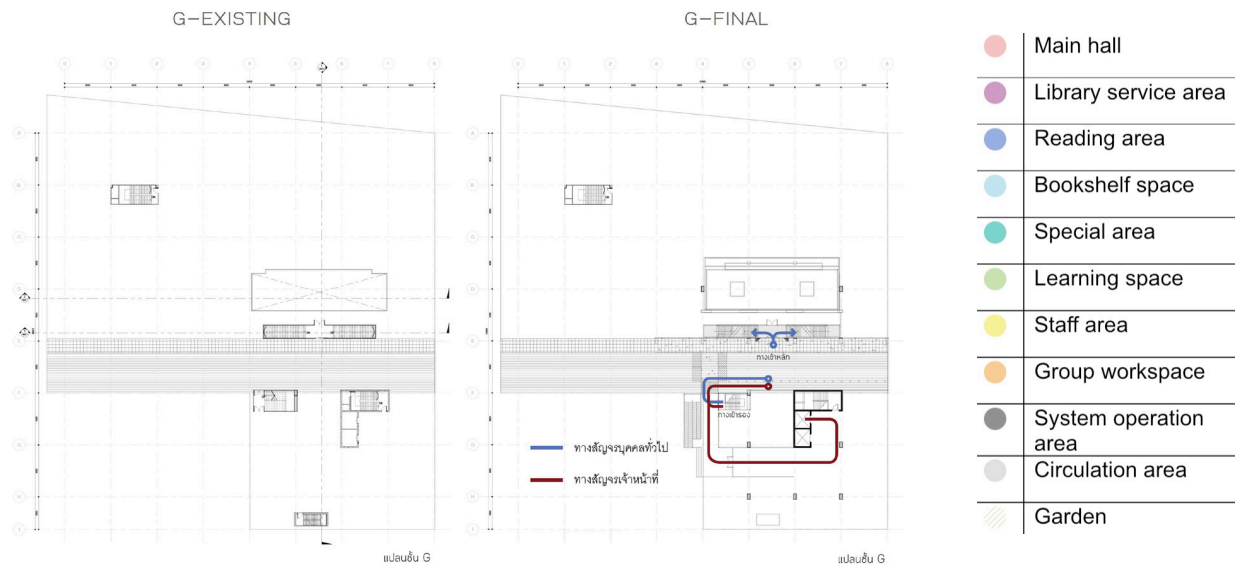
Comparison of the G floor spaces (left) Current plan and (right) New plan.
